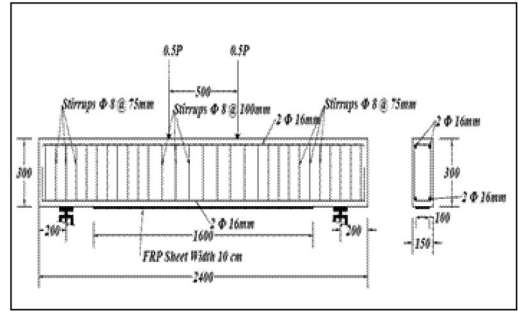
Specimen dimensions and reinforcement (all dimensions in mm).
